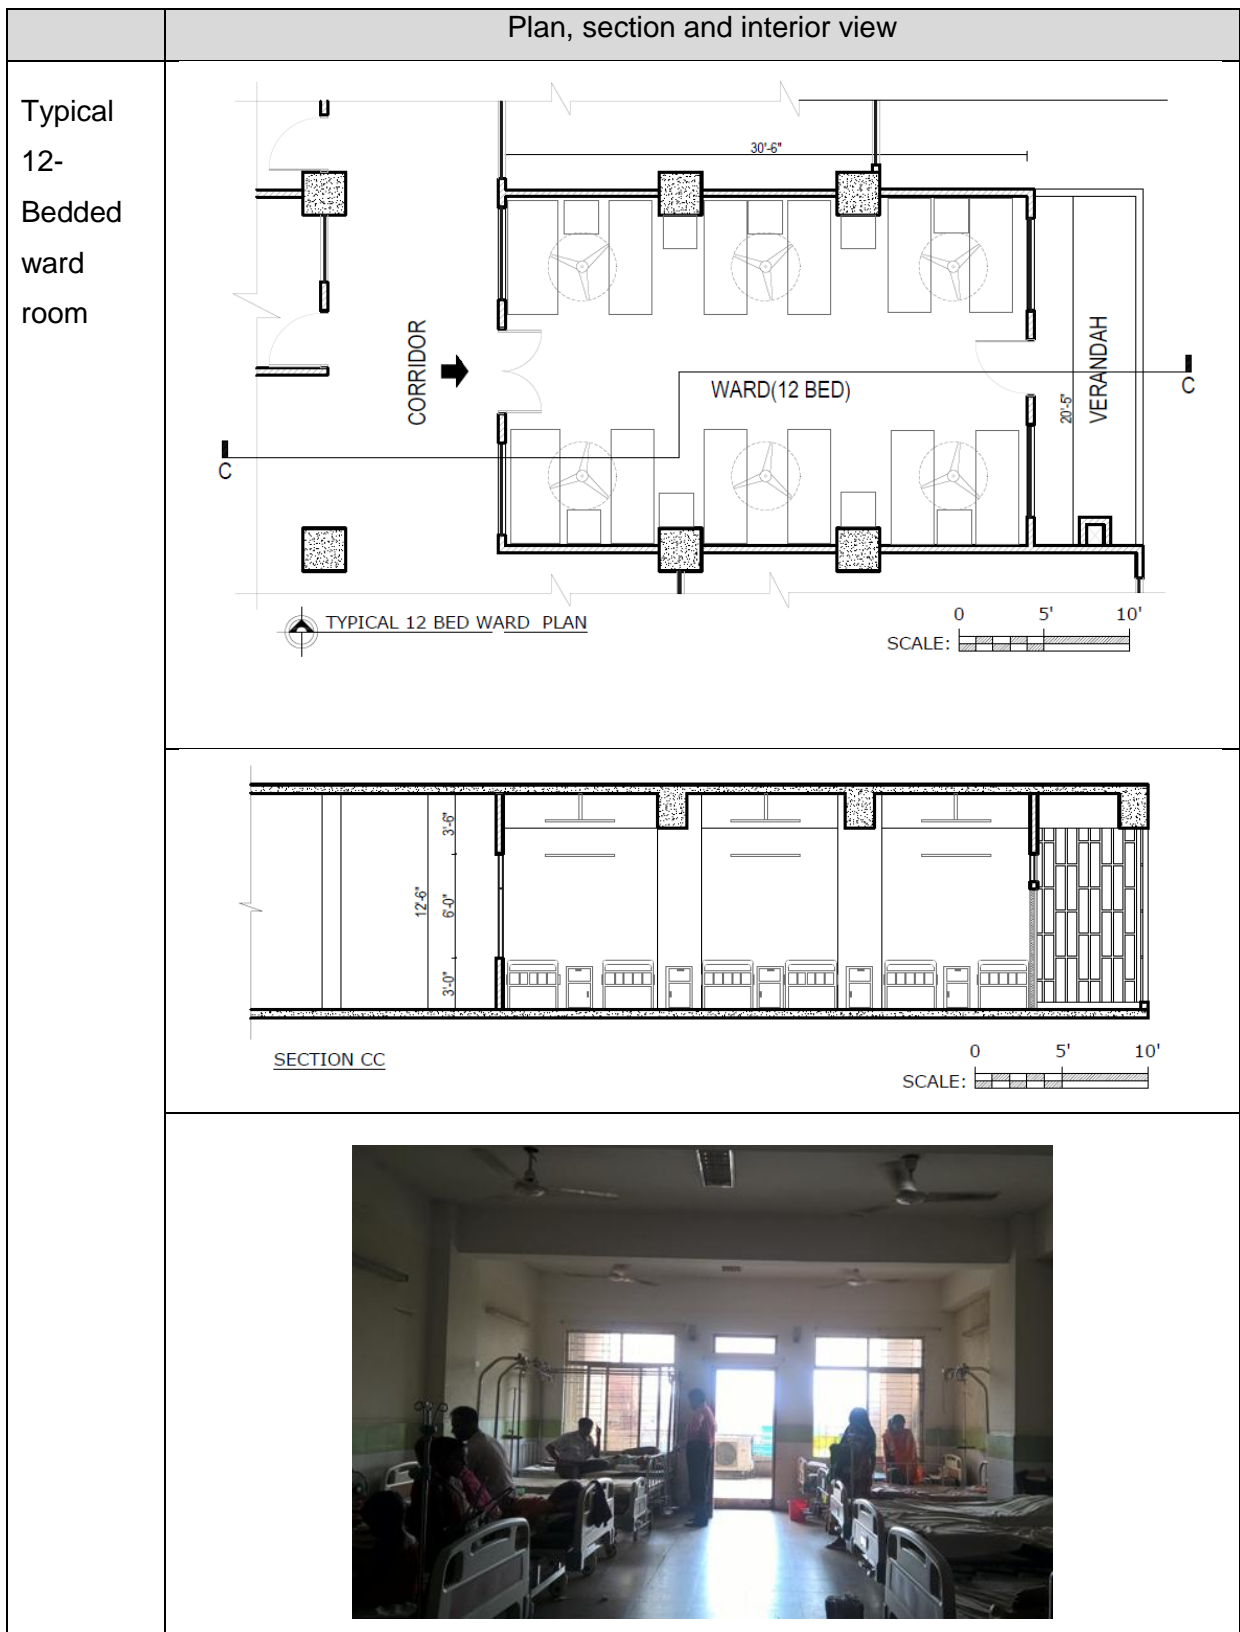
Plan, section and interior view of ward rooms with 12 beds
